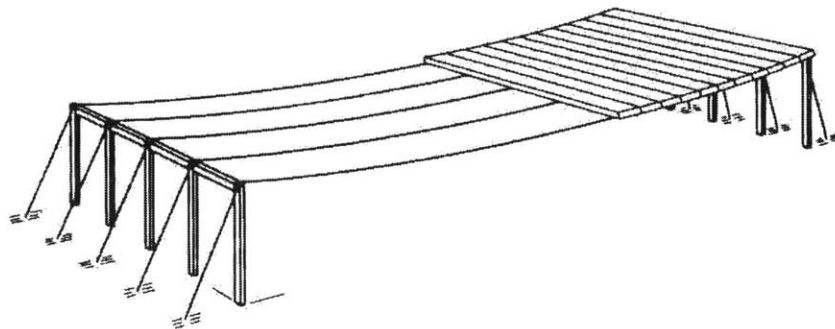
Suspended roof structure (Buchholdt pg. 3).
